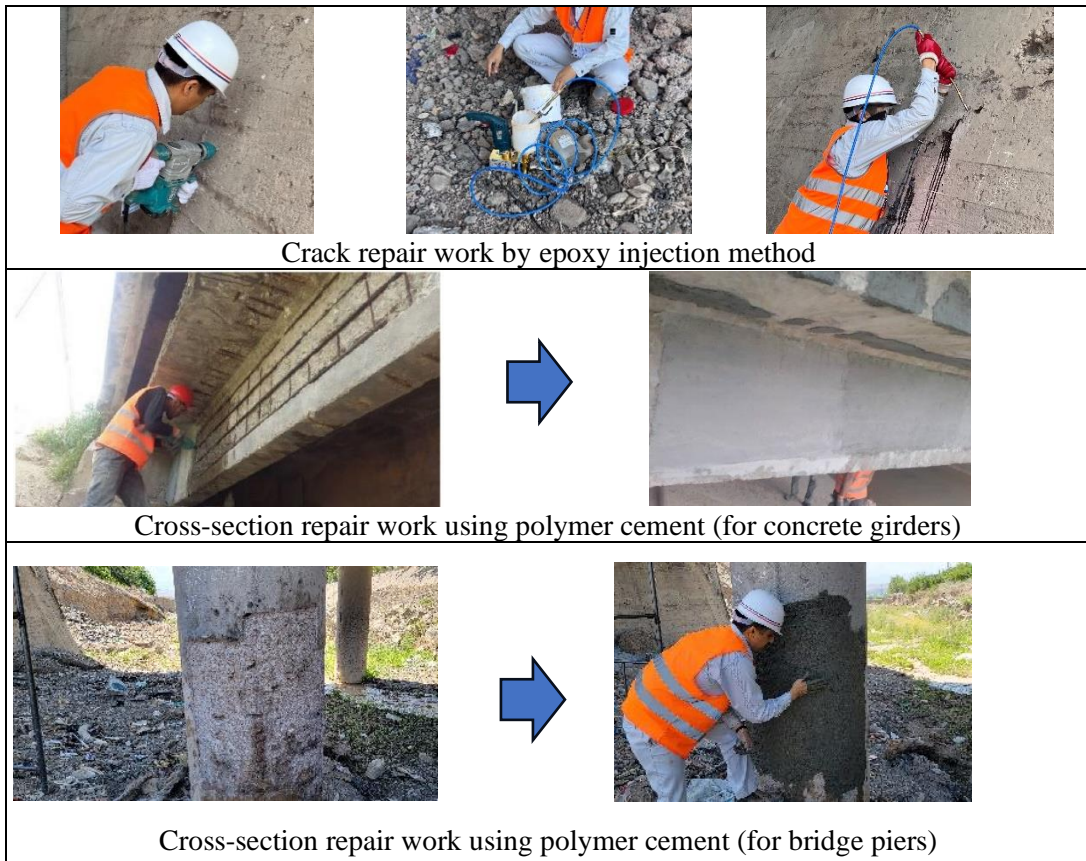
Outline of Pilot Project 2024 (1/2)
